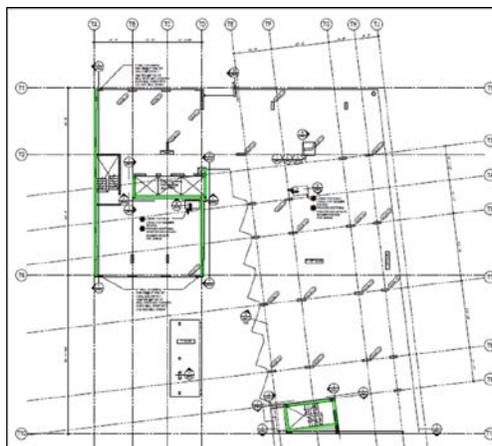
Typical floor plan of the building highlighting (in green) concrete shearwalls as SFRS.
